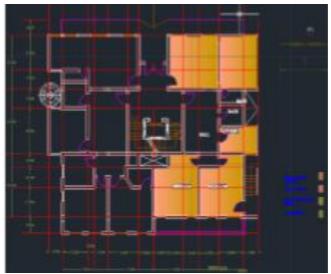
Mohammed Muntaser Ismaeeil house plan (Source: Author)
